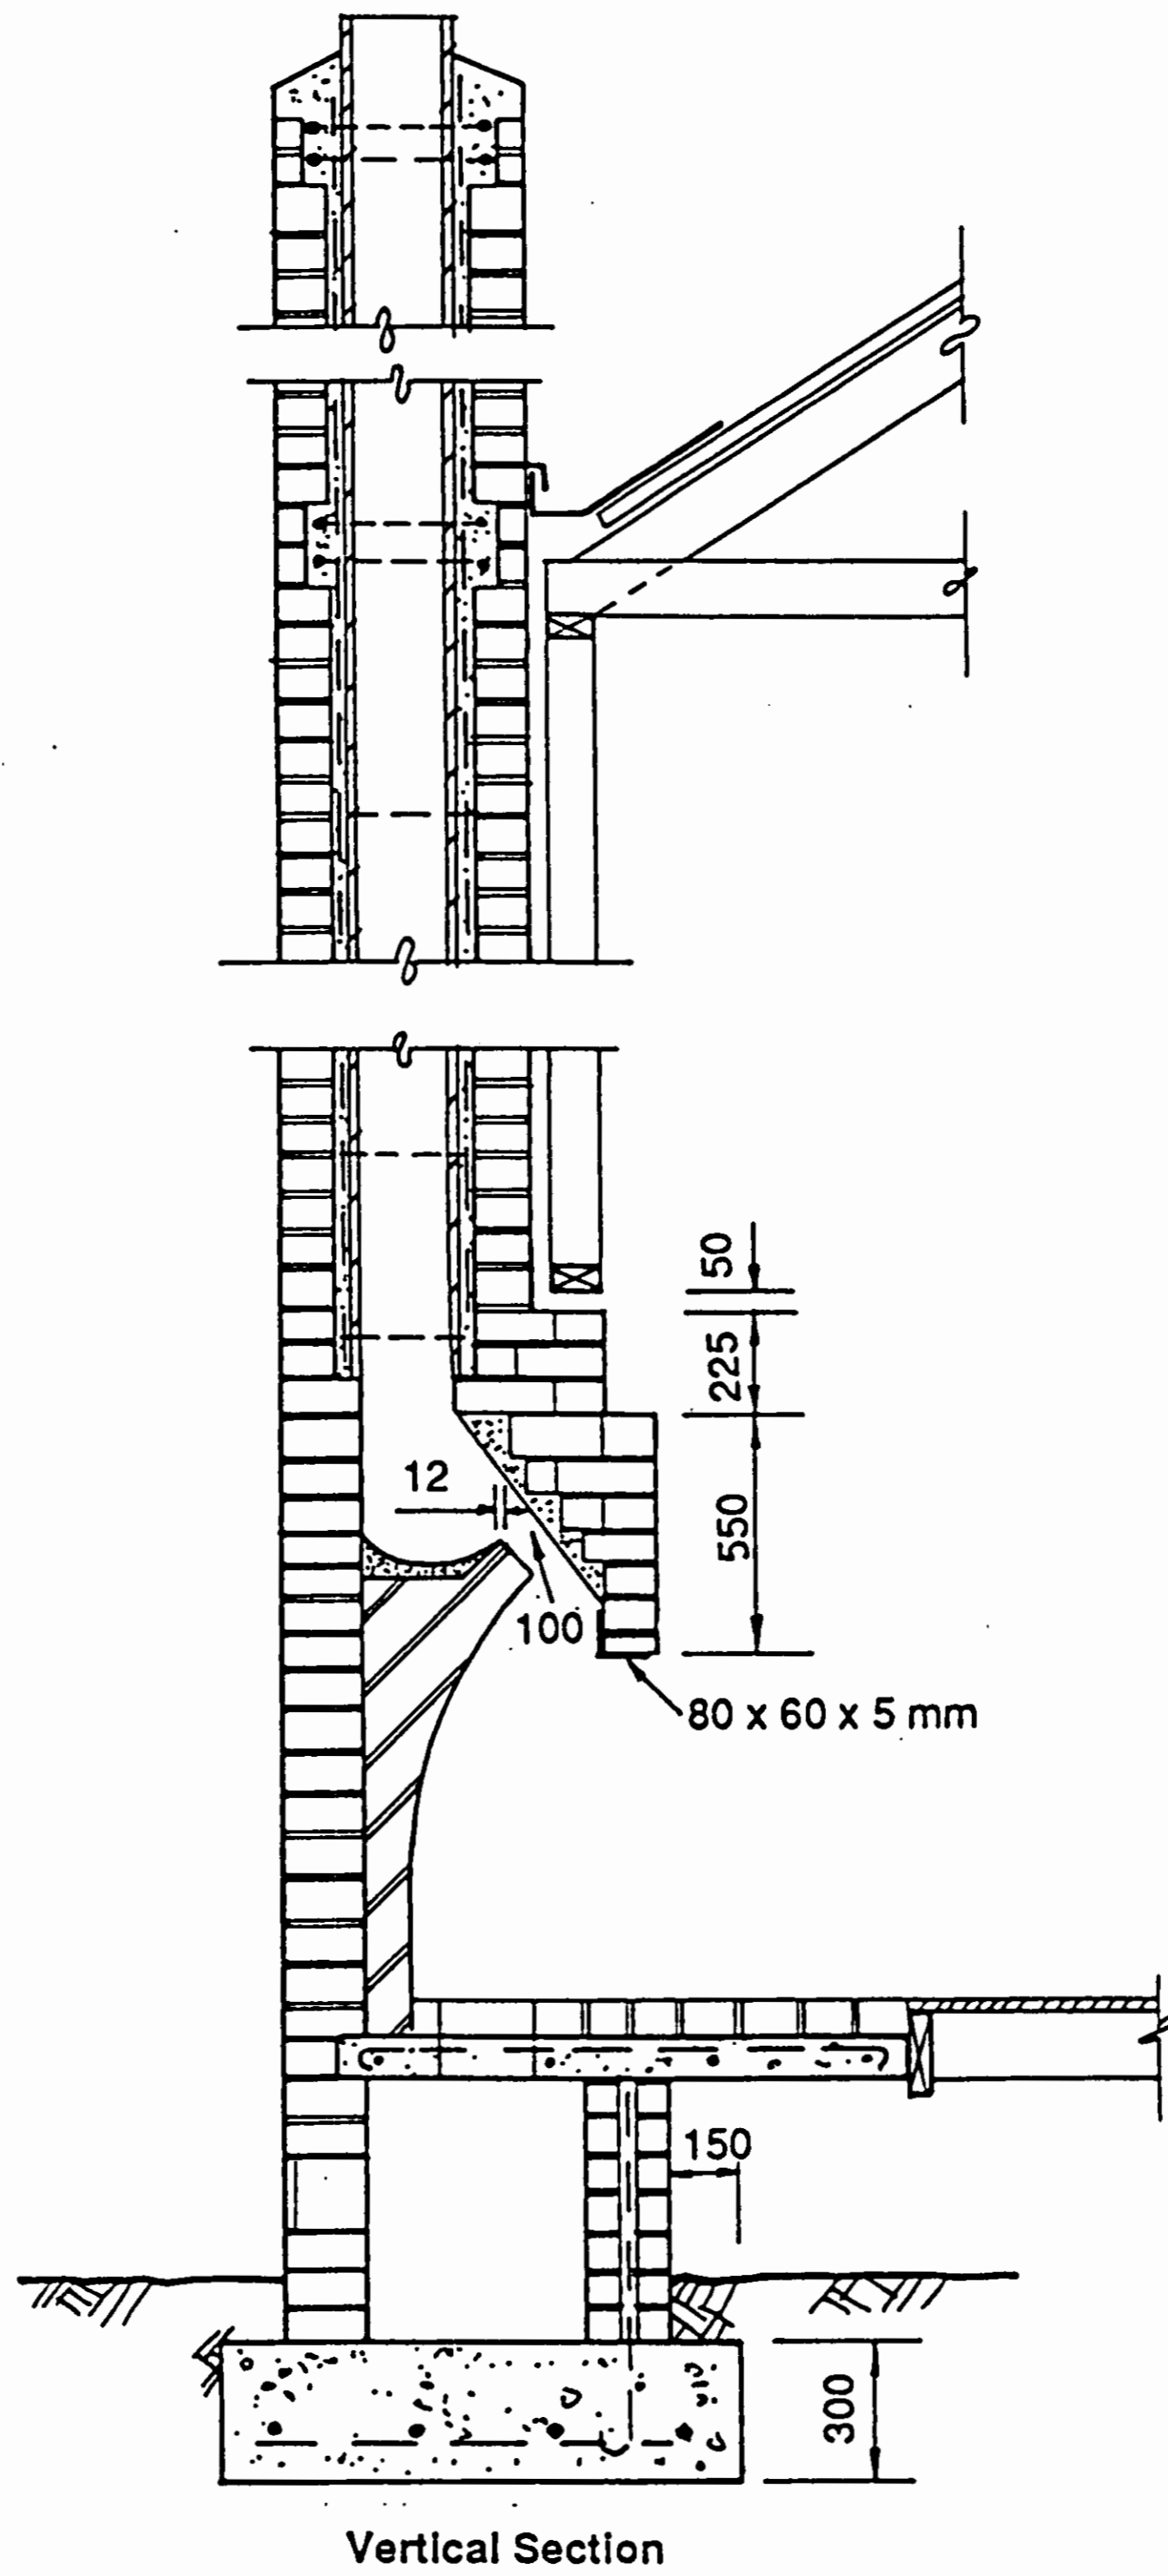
Reinforced brick chimney with flue liner (PACRA, 1981)
